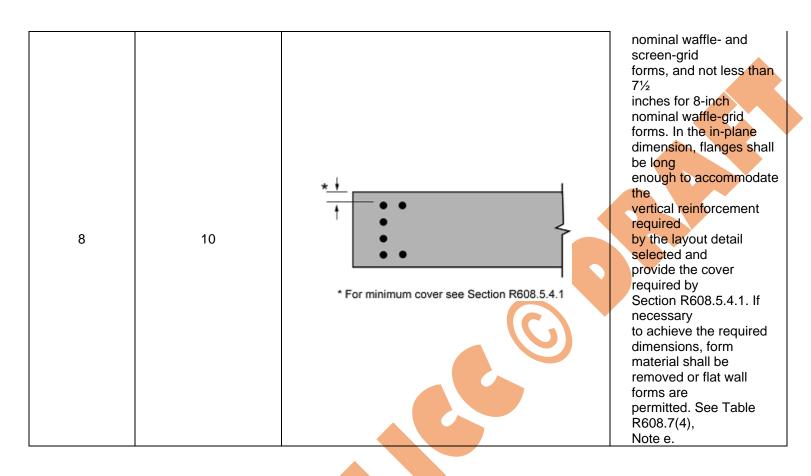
(2) VERTICAL REINFORCEMENT LAYOUT DETAIL
